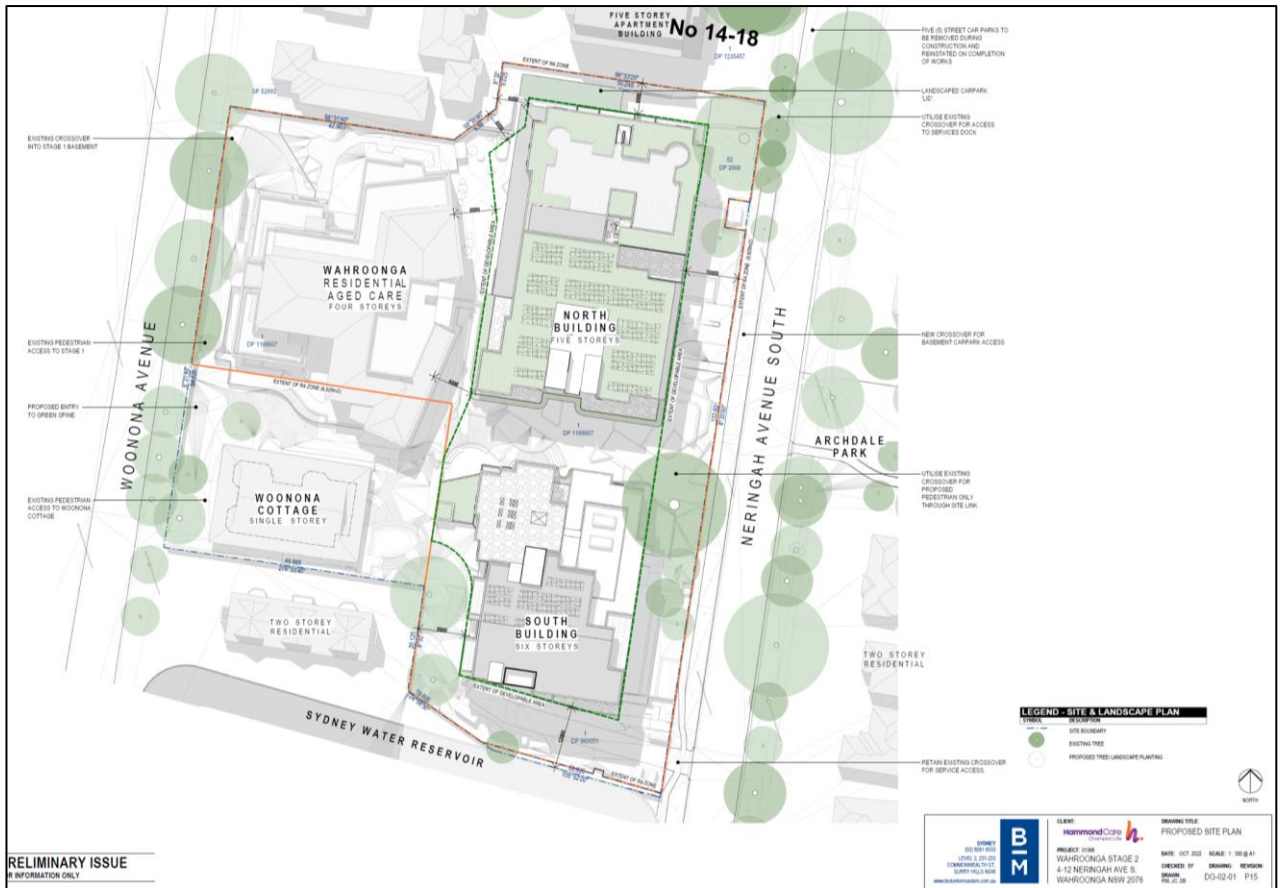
Proposed Site Plan with No 14-18 Neringah site notated
